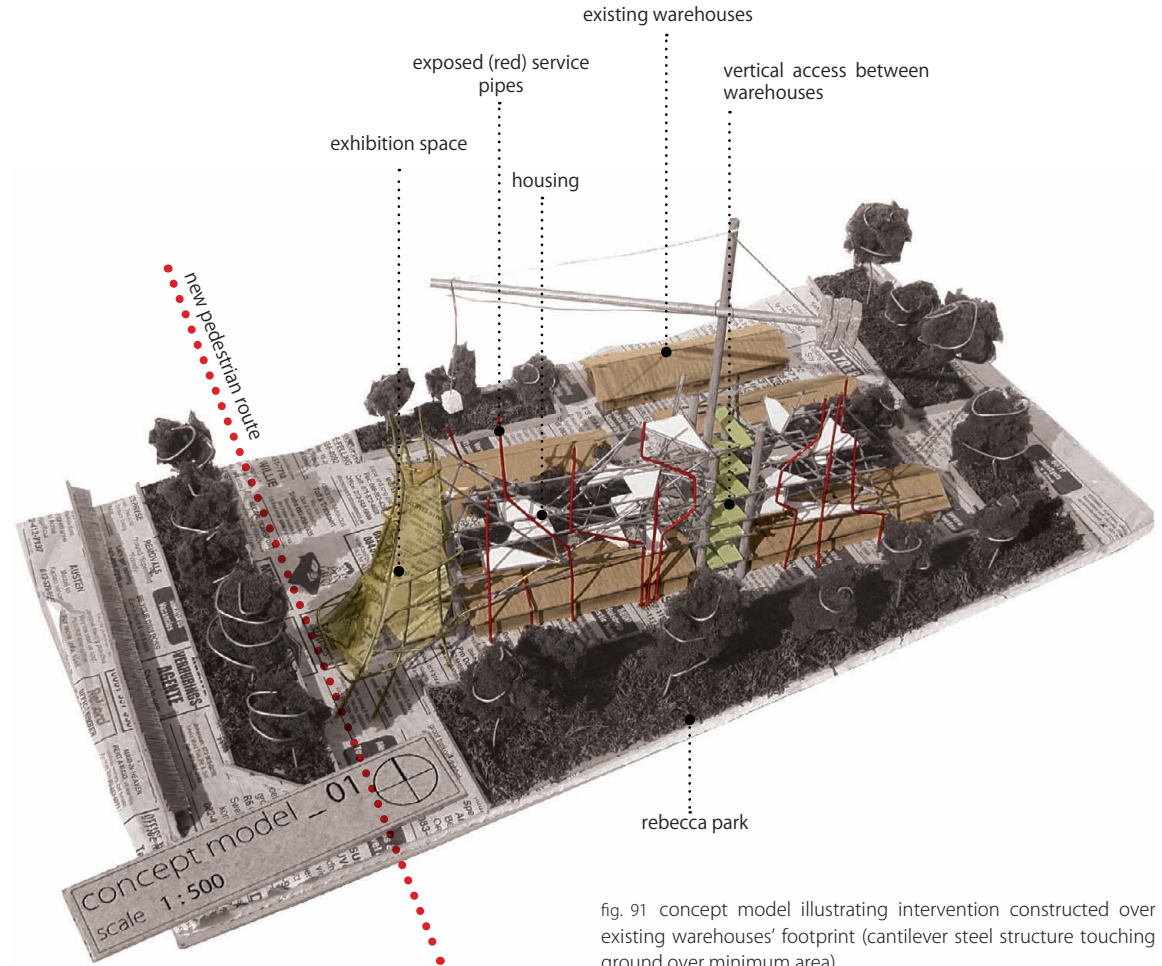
concept model illustrating intervention constructed over existing warehouses' footprint (cantilever steel structure touching ground over minimum area)
